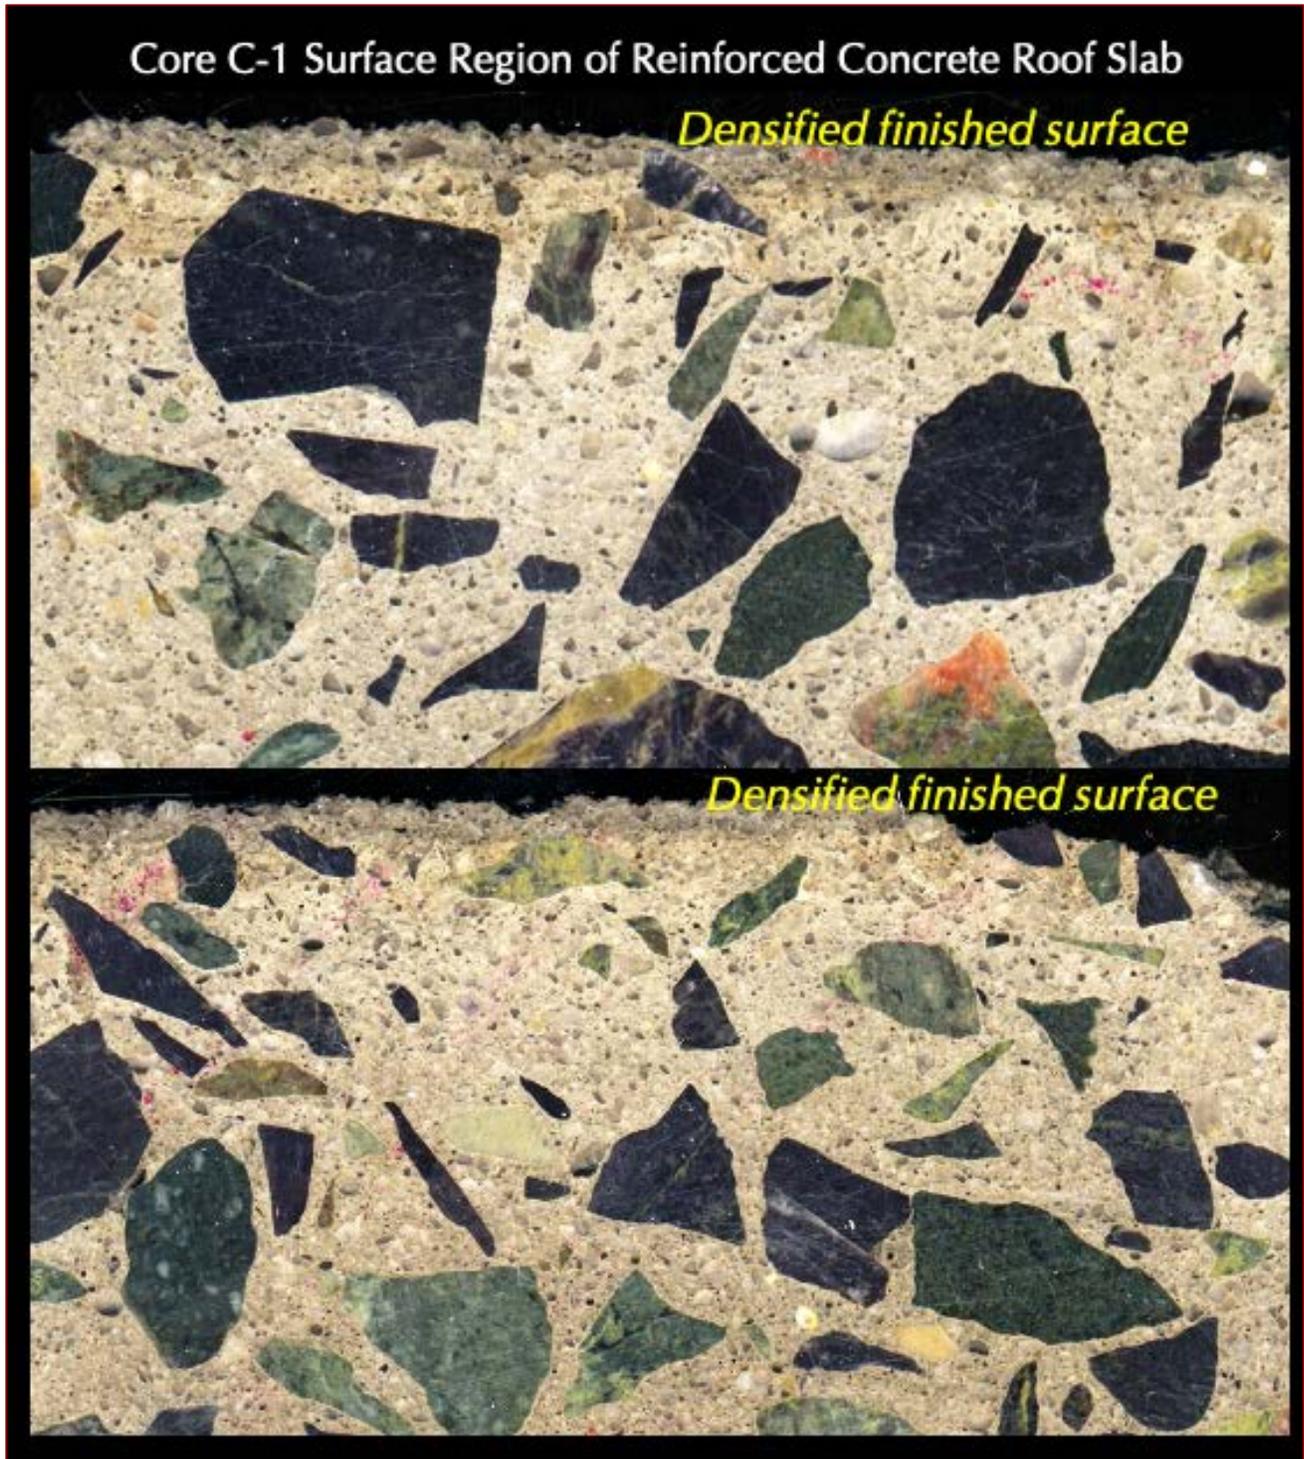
Lapped cross section of reinforced concrete roof top slab (RCS) portion of Core C-1 showing crushed volcanic stone coarse aggregate of 1 in. (25 mm) nominal size which are dense, hard, medium greenish-gray to black, angular, equidimensional to elongated, sound, well-graded, and well-distributed. Notice the darker gray densified finished surface at the top $\frac{1}{8}$ in. due to finishing-induced densification of the surface.
